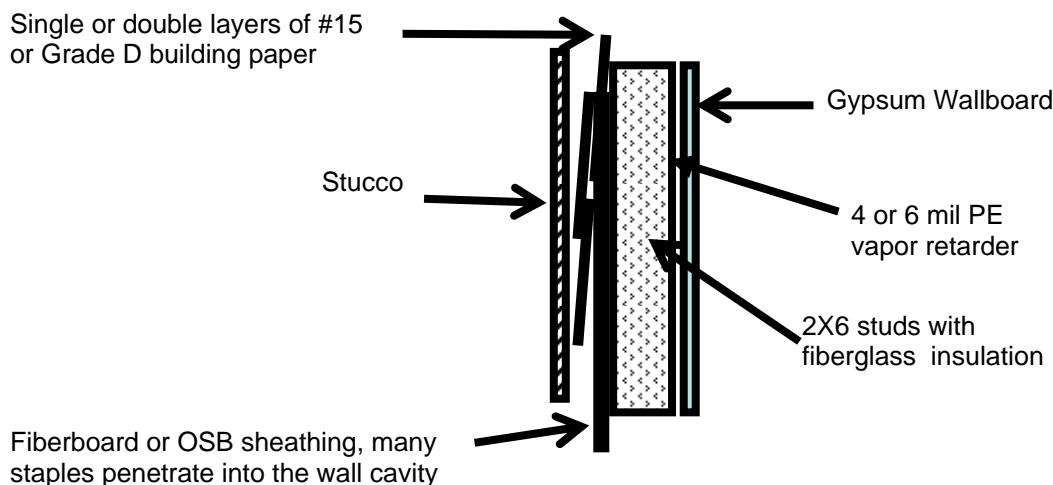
Stucco wall design typical of Minnesota houses built after 1980
